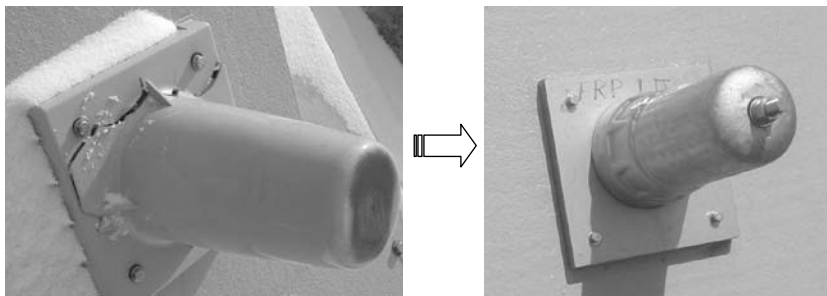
Anchor cap repair (replacement of anchor cap)
